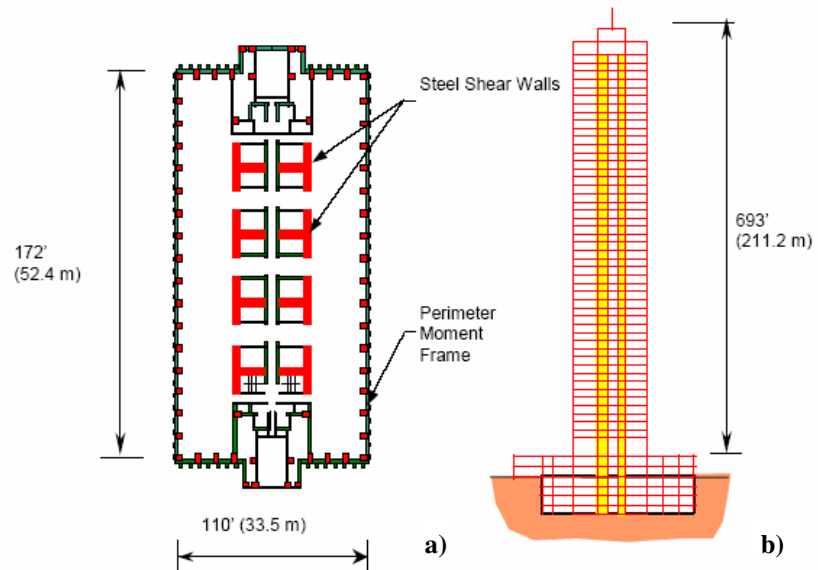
Plan (a) and transverse (b) sections of the 56-storeys building in Tokyo
